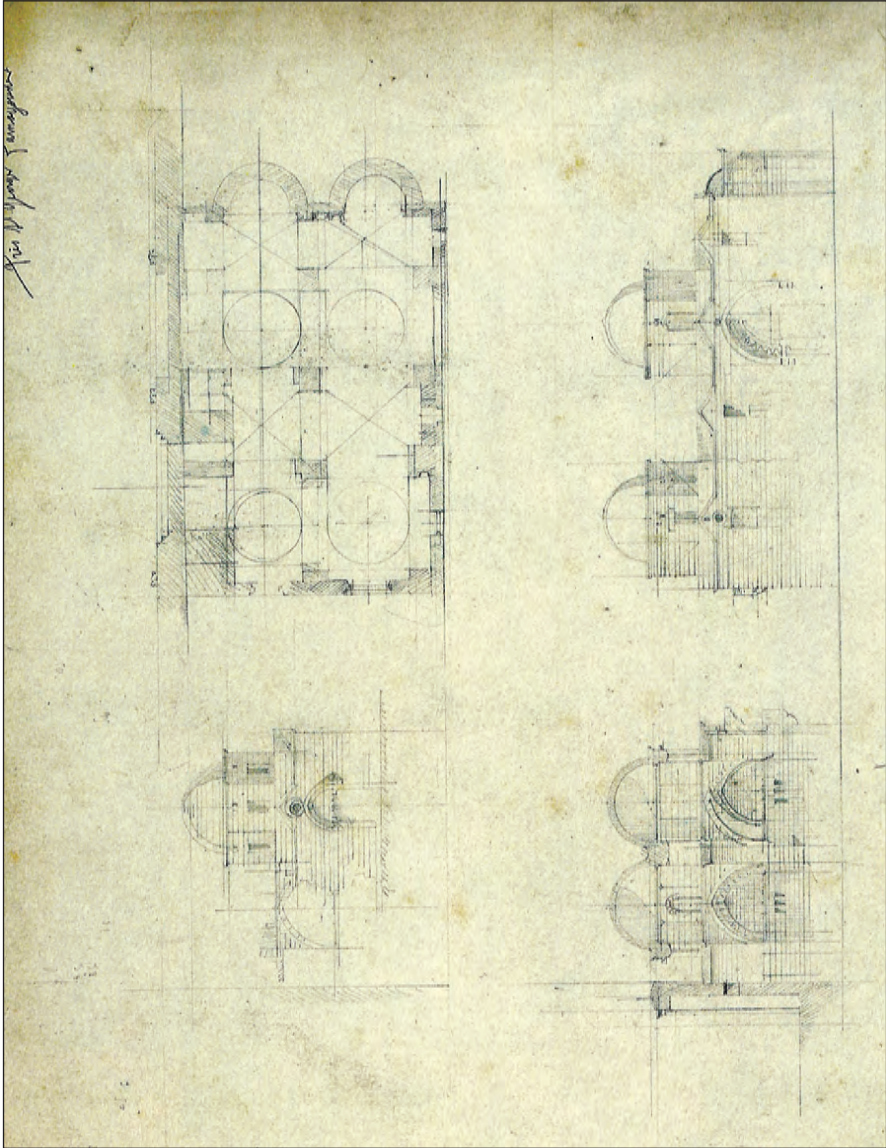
Hagios Epiphaniios, Elevations, Section and Plan, c. 1860 – Edmond Duthoit
